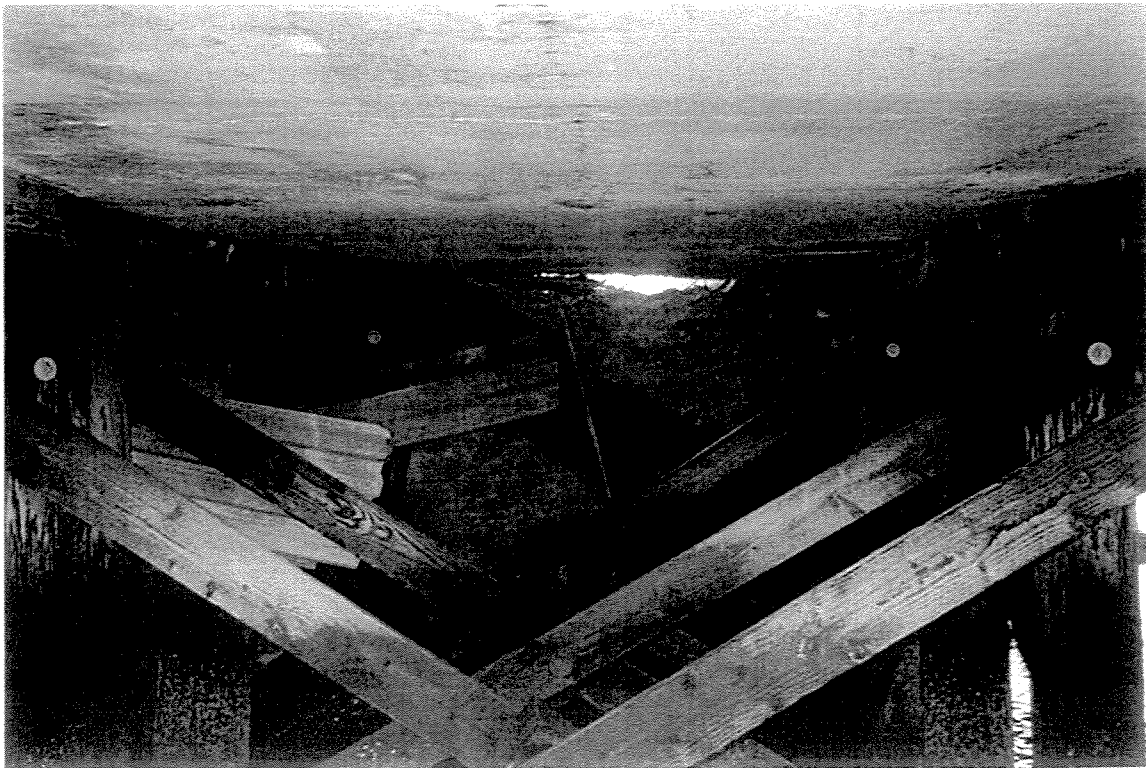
Between pile bents 78 and 77 at the north side of the pier. General view of collapsed area with severely displaced piles and broken timber caps, looking south.
